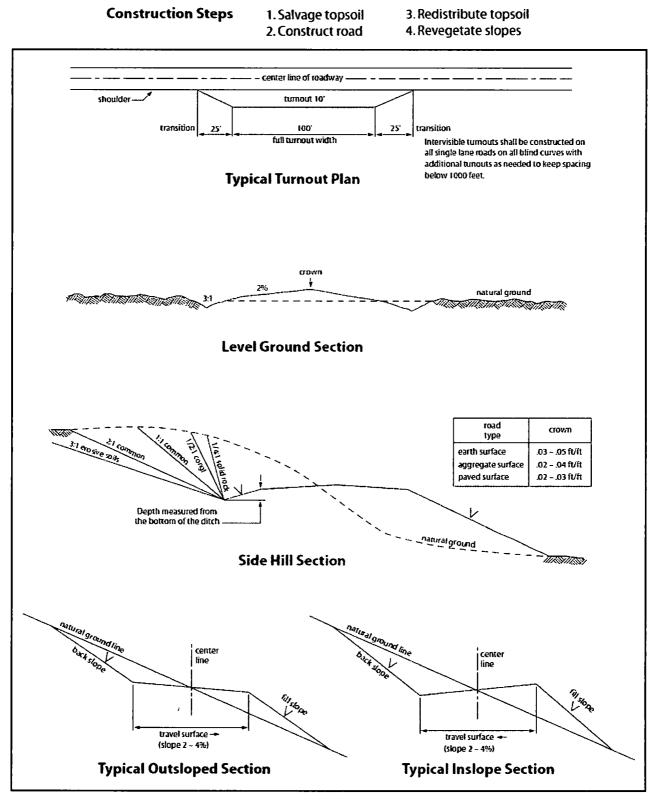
Cross-sections and plans for typical road sections representative of BLM resource or FS local and higher-class roads.
